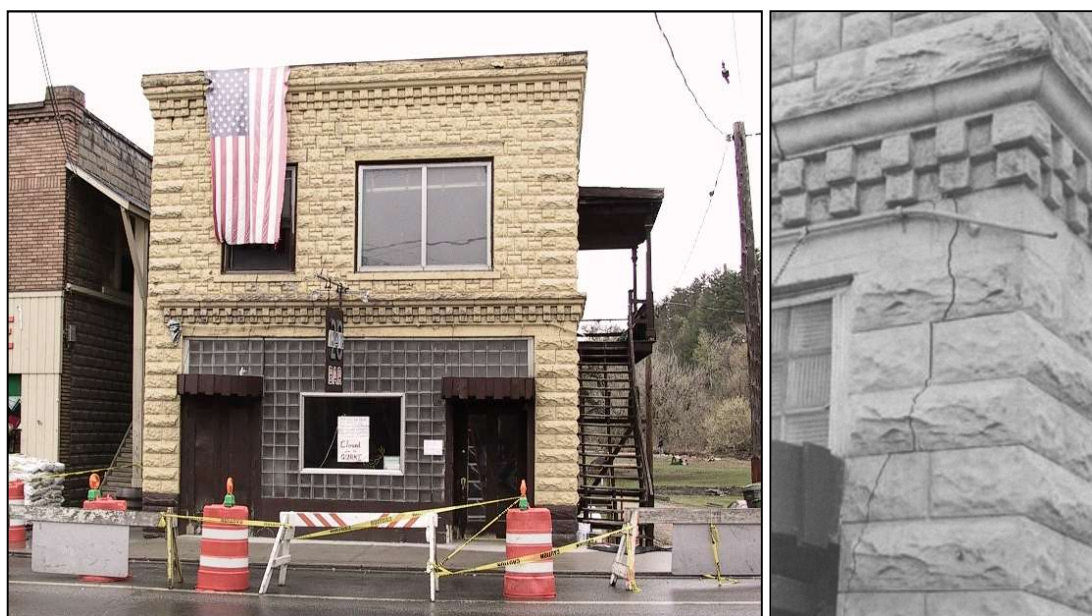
Damage to architectural unreinforced masonry front wall. From M. Withers, CERL, Univ. Memphis (LDEO) (left) and Pierre & Lamontagne (2004) (right).
